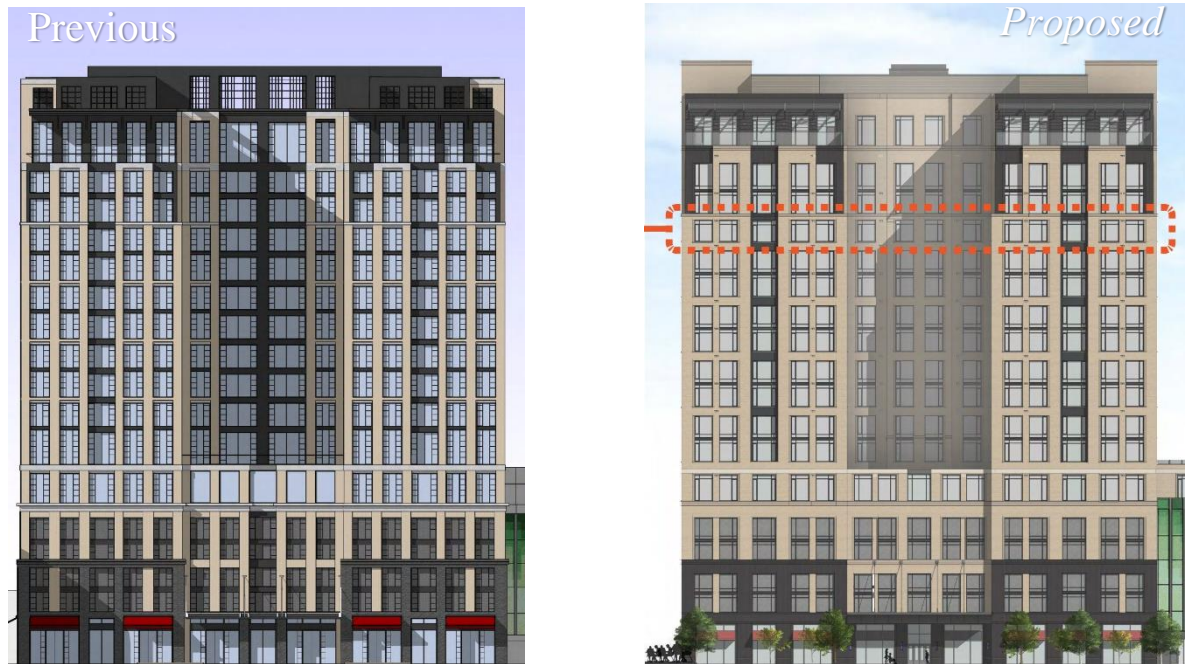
The Applicant proposes to eliminate the structural glass along Eisenhower Avenue retail level
